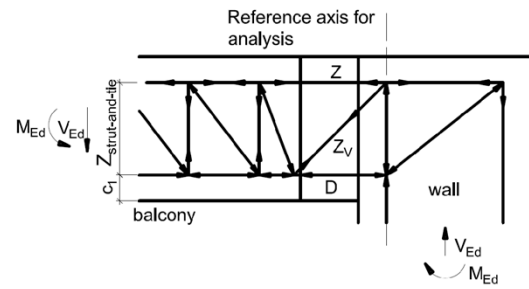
Schöck Isokorb® Type K-O and K-O-F with connection to wall
